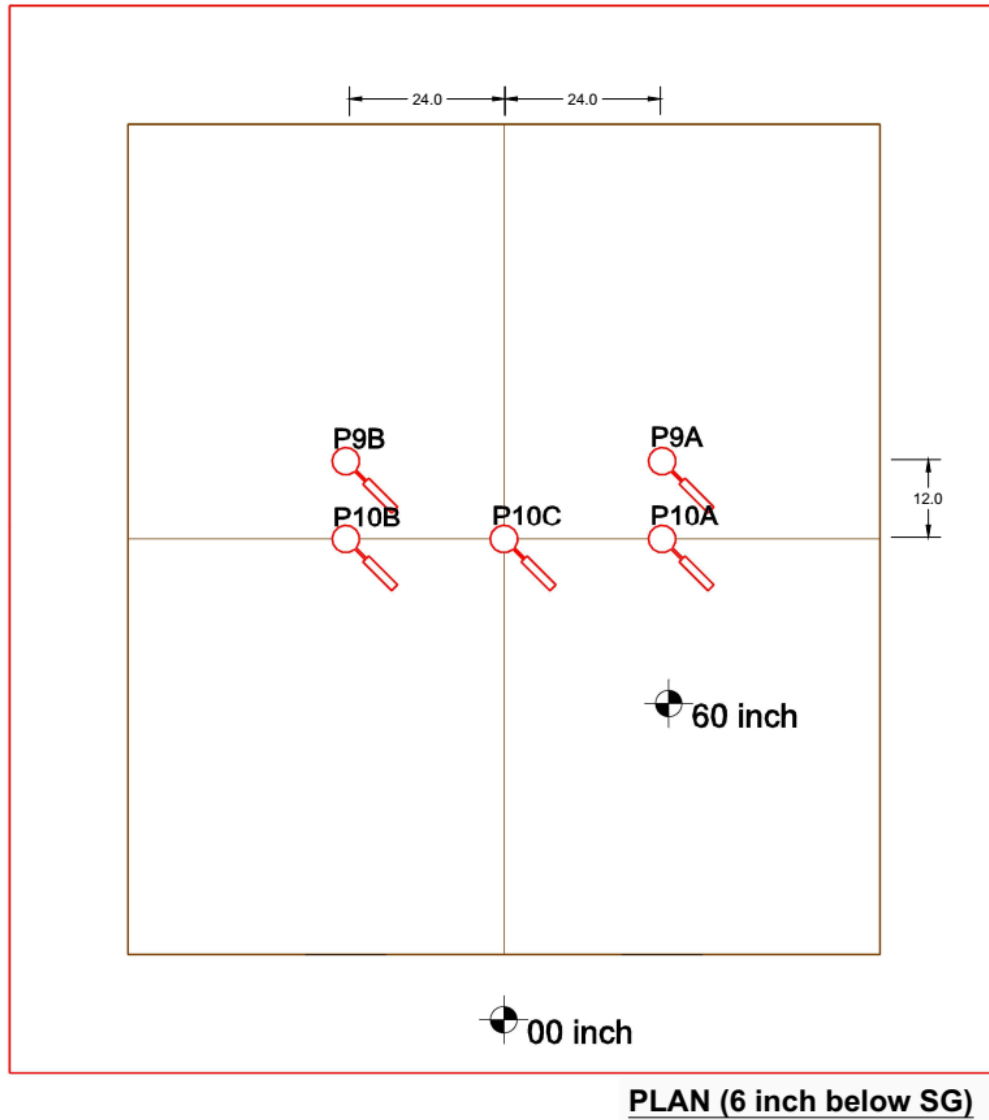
Illustration. Plan view of large-scale-box instrumentations in experiment No. 5 (elevation of 72 inches).
